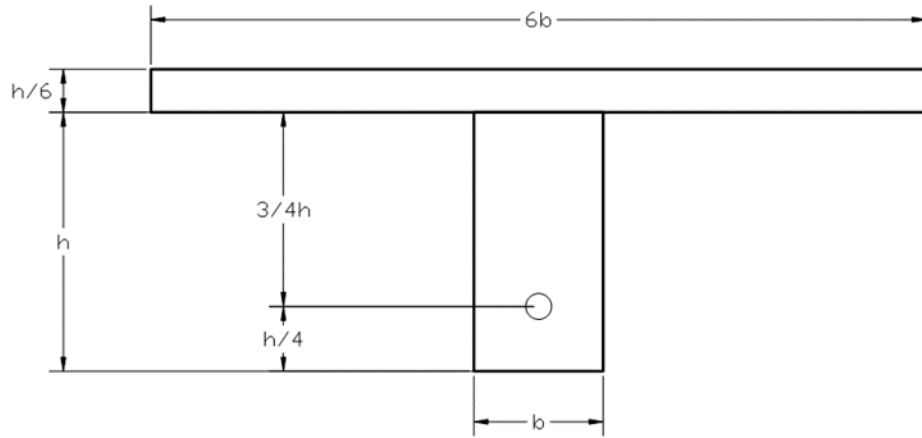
General Rectangular Prestressed Beam with Composite Decking
